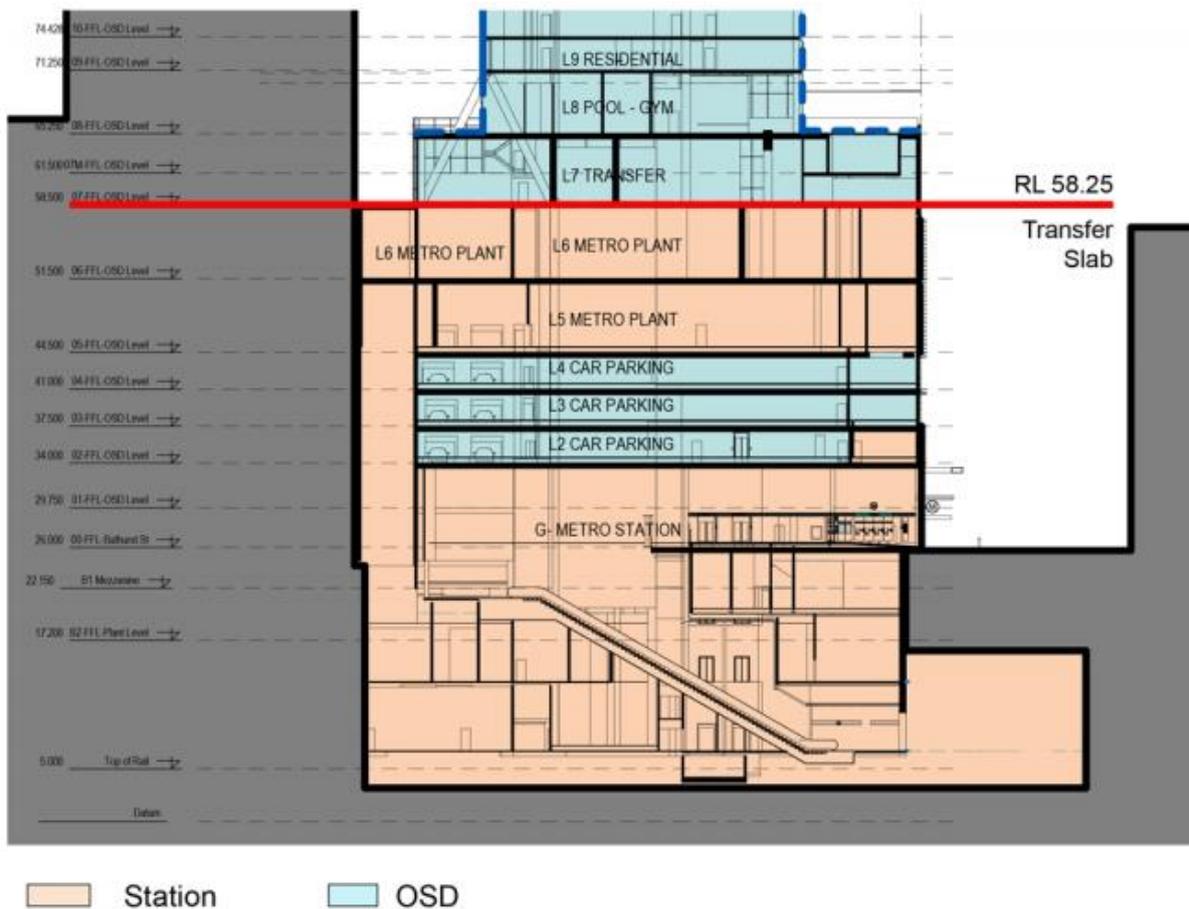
Plan of proposal demonstrating location of transfer slab at RL 58.25
